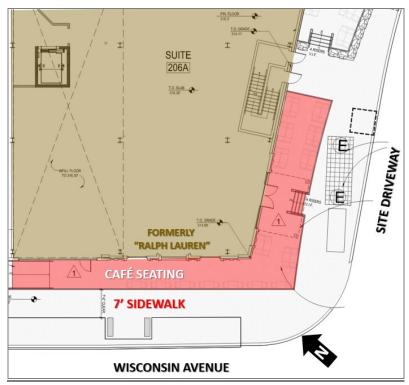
Wisconsin Avenue Outdoor Dining Space Expansion 82001021H (The Collection I; TSM Zone) (Plan View)
